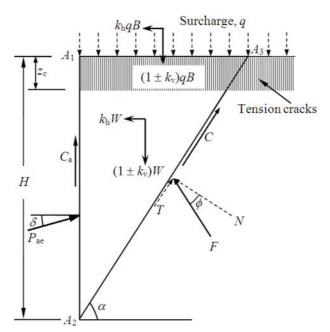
Forces acting on a trial failure wedge consisting of c- ϕ soil backfill with tension cracks behind a rigid retaining wall in active state
